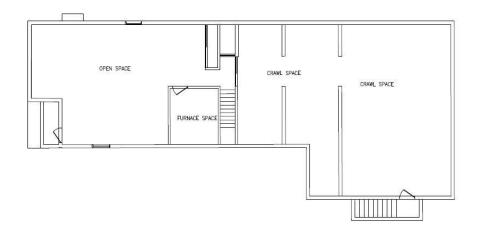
The basement level of 347 Queen Street South. (Drawing by client, Jan. 2021.)
